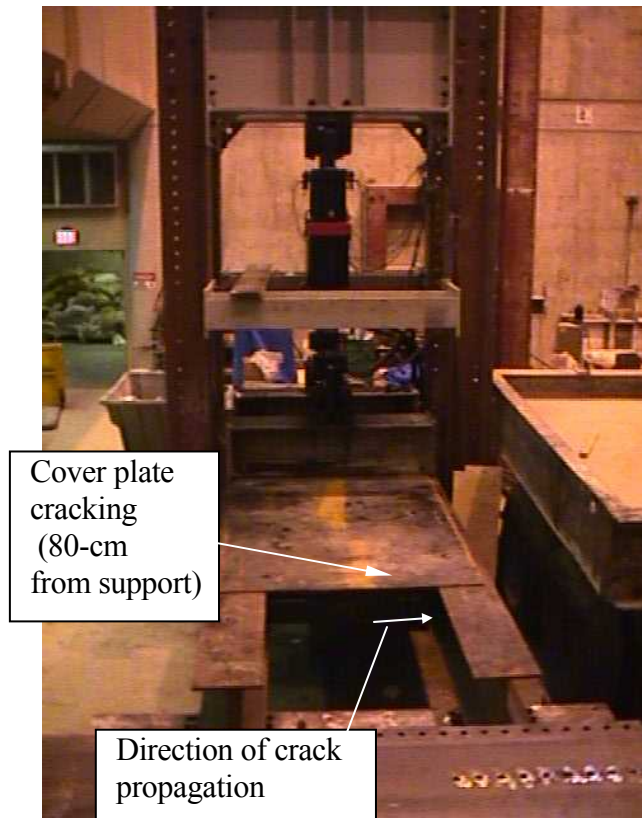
Cover plate detail prior to repair with and crack propagation direction indicated.
